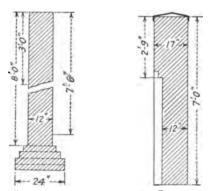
Section of Wall. Fig. 3. Section of Cornice.
